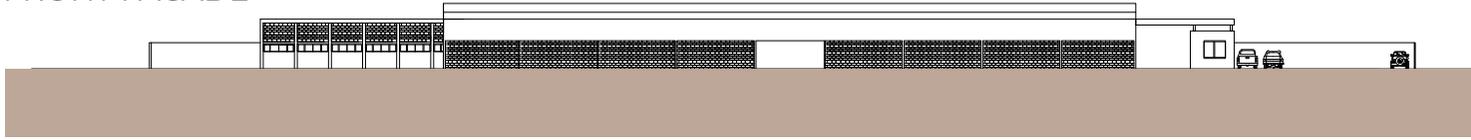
Planimetry provided by Padre Fabio Estupiñal
